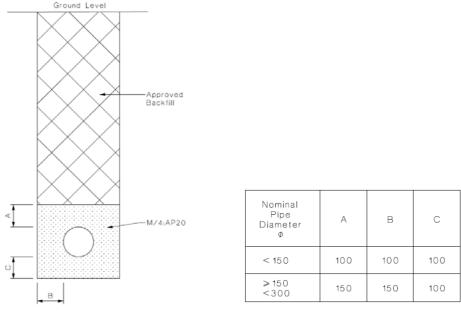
Schematic illustration of backfill and pipe-laying details (units in mm)
